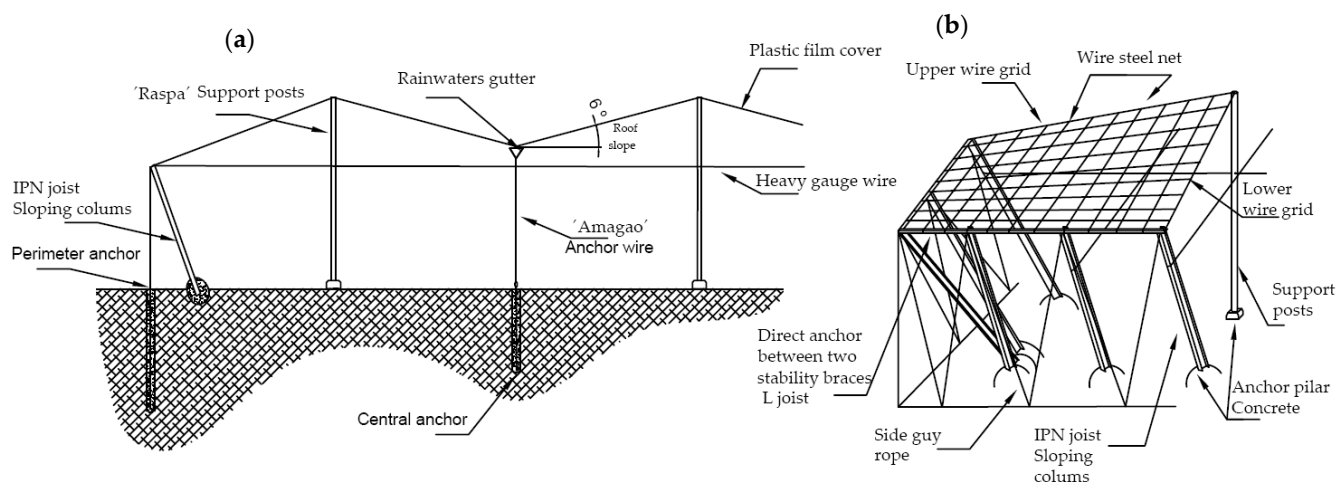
“*Raspa y Amagado*” greenhouse: (a) section; (b) corner greenhouse details.
